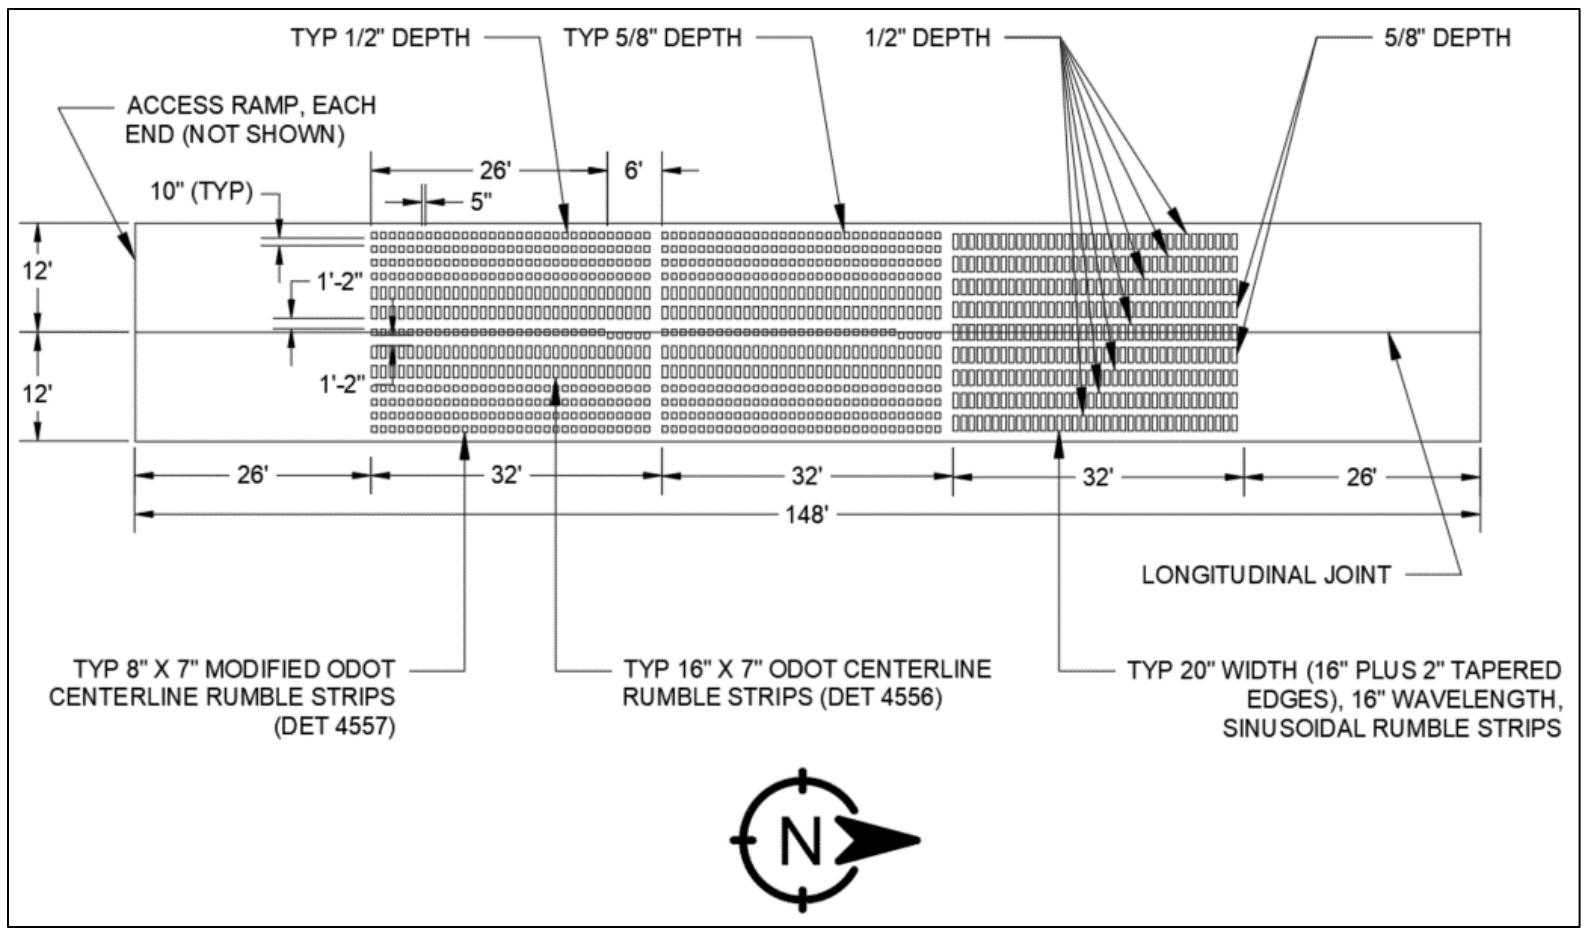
CLRS installation plan at the test strip (" corresponds to inches and ' corresponds to feet)
